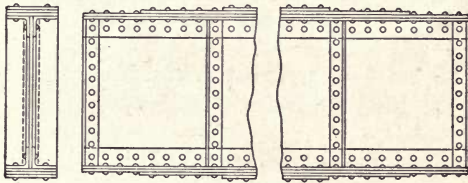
Plate Girder with Cover Plates and Stiffeners
